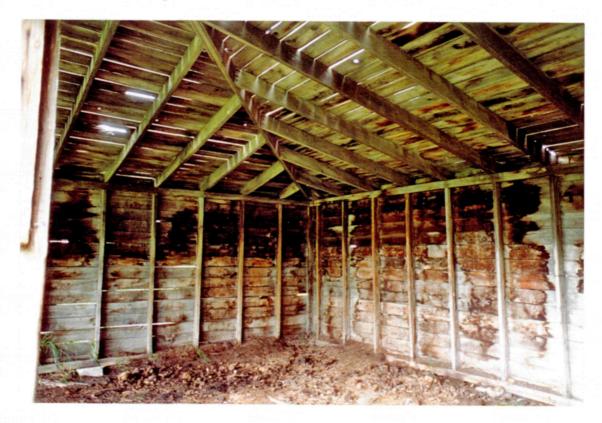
The Calving shed area, interior structural details. Parks Canada
